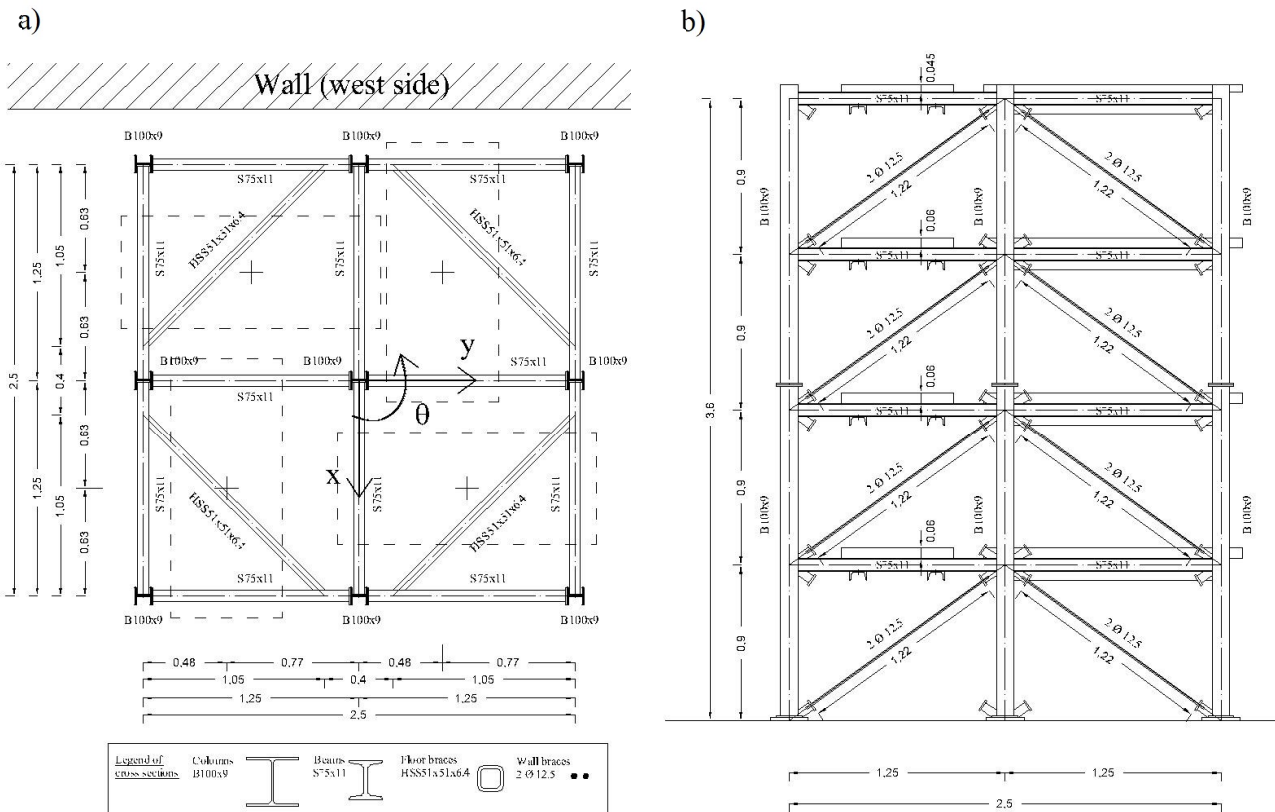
Geometry of the steel frame structure tested under ambient vibrations (dimensions in m): a) plan view; b) lateral view of the south face.
